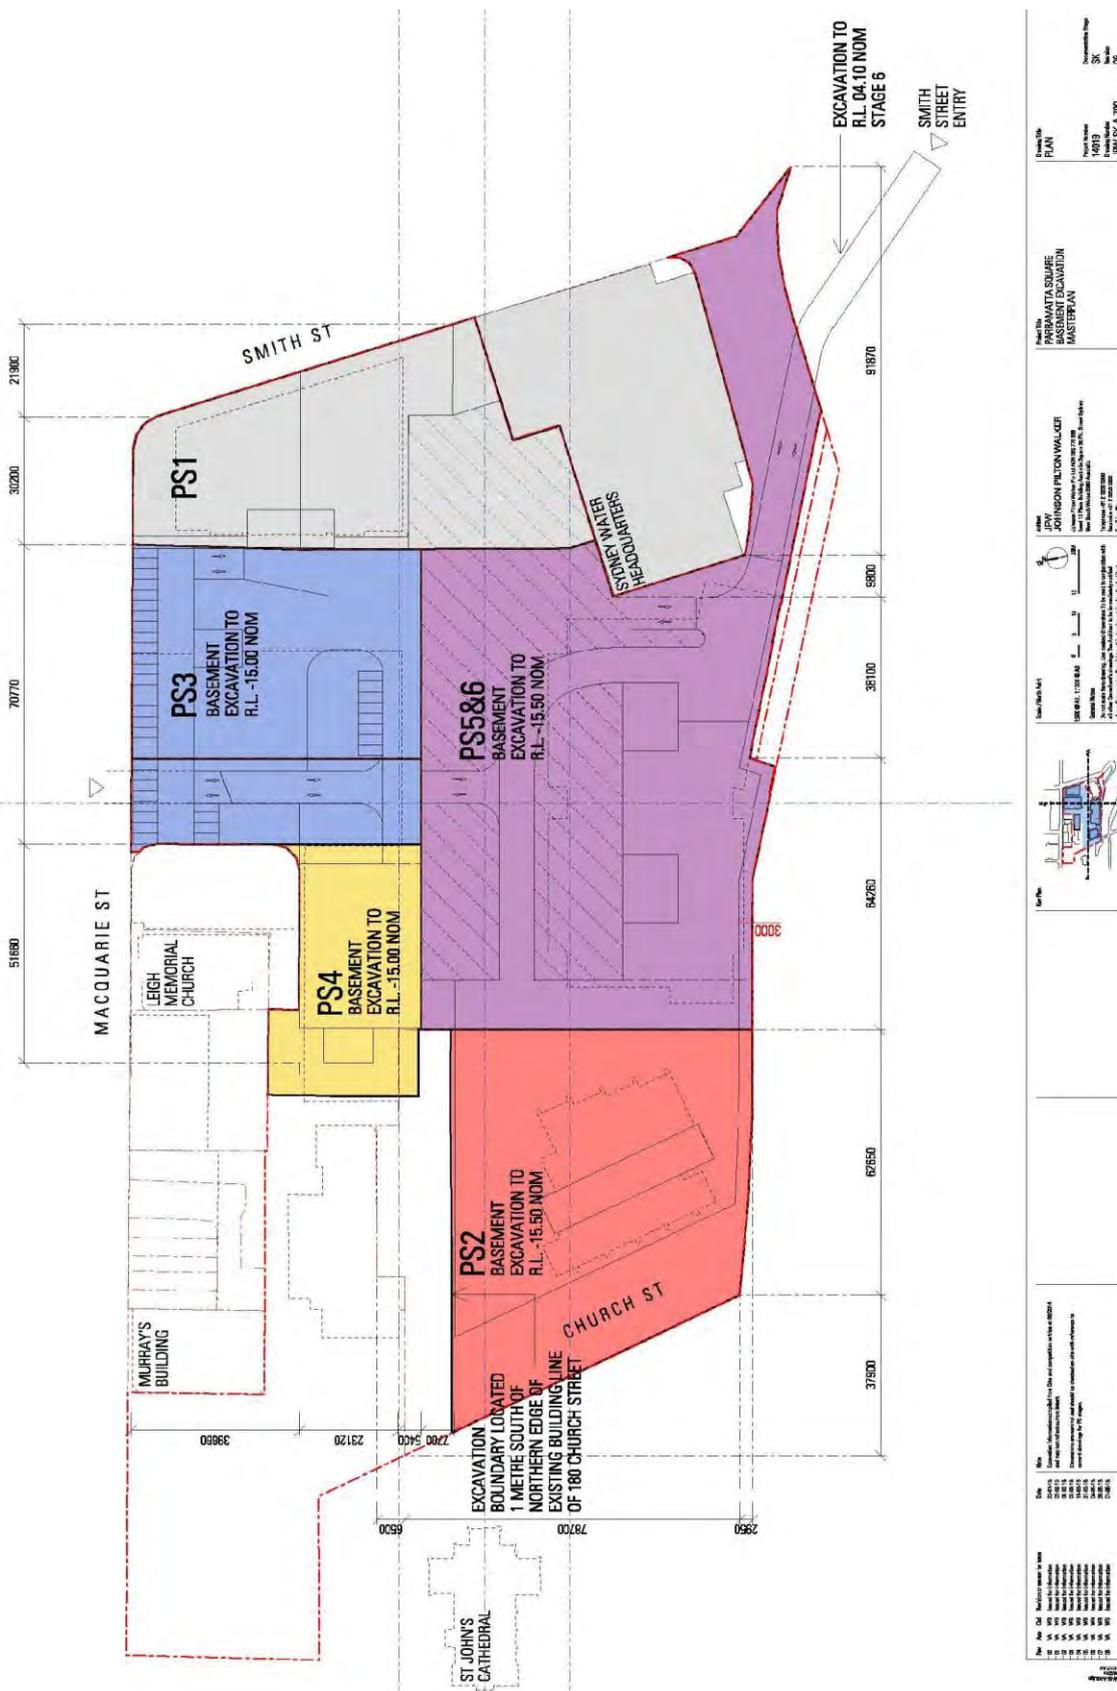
Plan showing the area boundaries for Parramatta Square and the proposed location of basements. PS5&6 is shaded purple and includes a section of Darcy Street. Architect, JPW, 1/06/2015.
